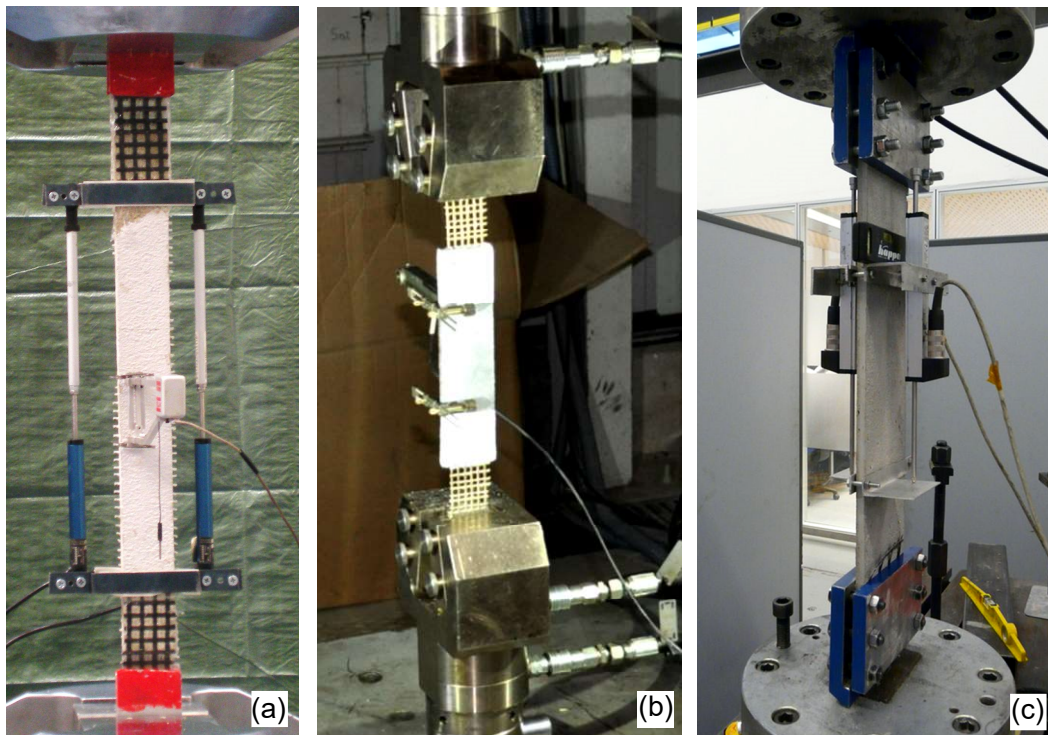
Setup used for tensile tests by UNIRM3 (a), UMINHO (b) and TECNALIA (c)
